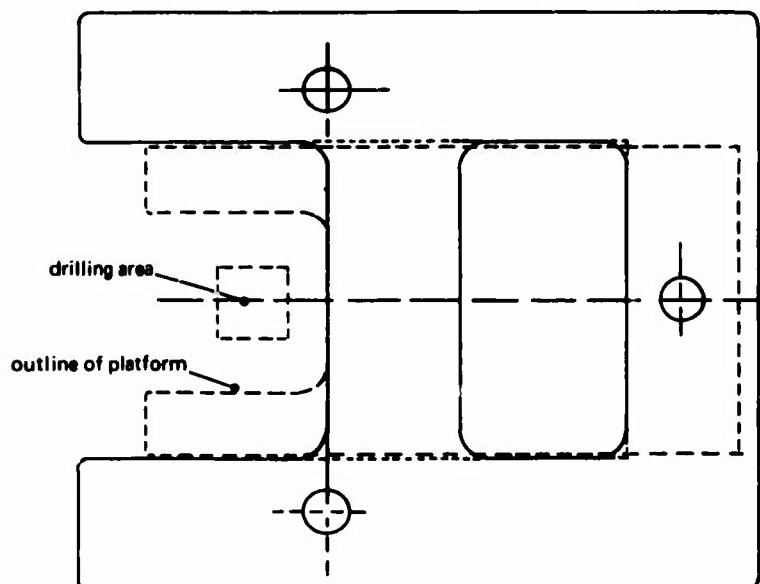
Typical jack-up rig with mat foundation. (From Schmid, 1969.)
